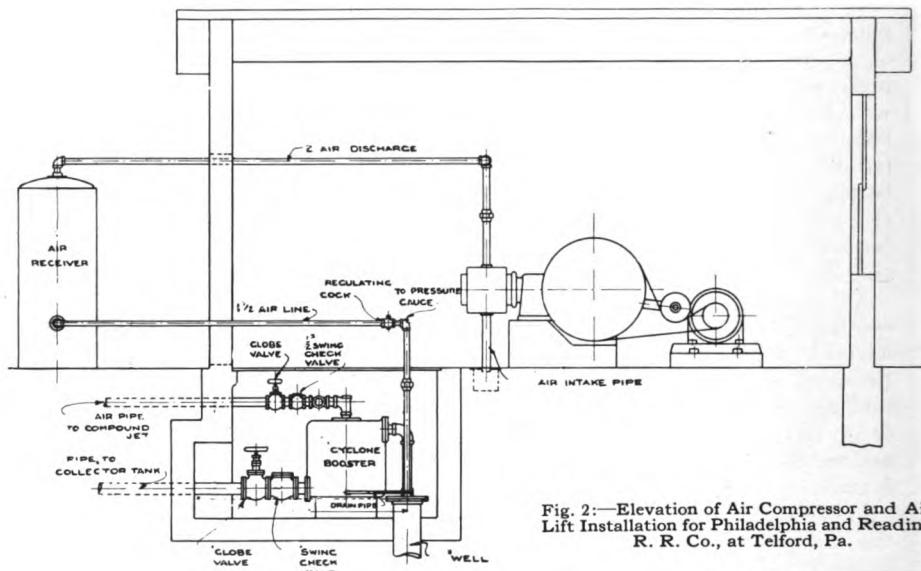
Elevation of Air Compressor and Air Lift Installation for Philadelphia and Reading R. R. Co., at Telford, Pa.
